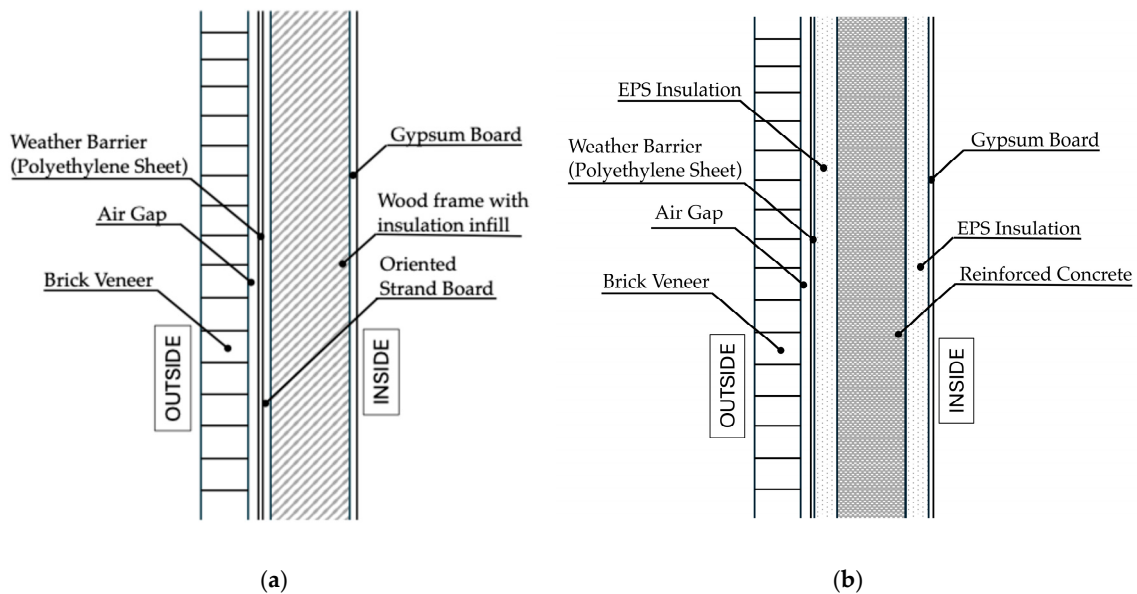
(a) Exterior wall section of a wood-framed house. (b) Exterior wall section of an ICF house.
